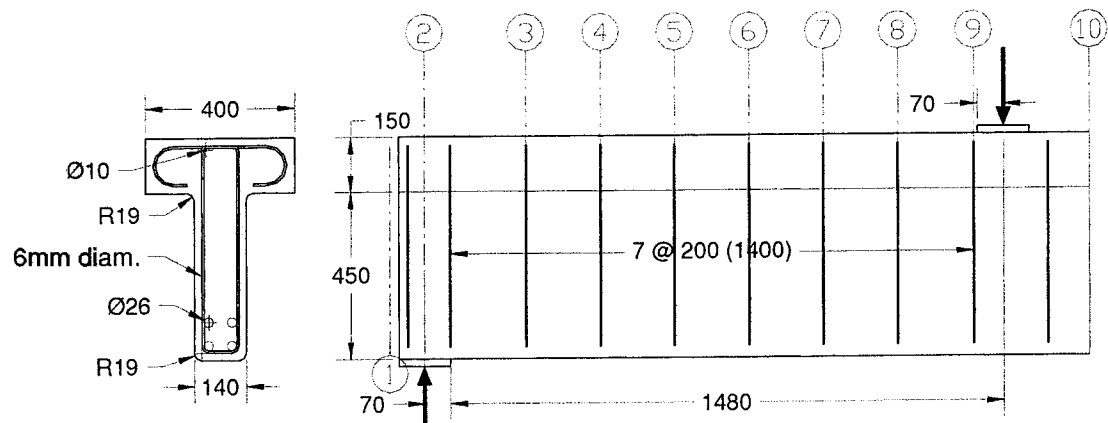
T-beam Cross Section and Stirrup Layout with 200 mm Spacing
